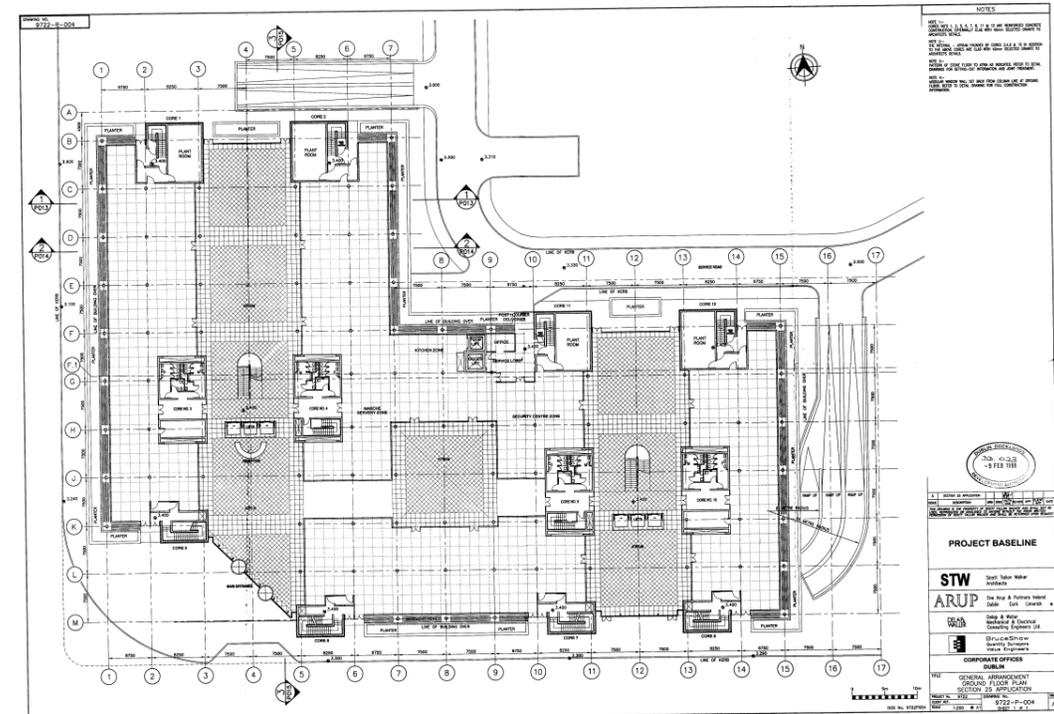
1998 ground floor plan of Citibank 1 North Wall Quay by STW.
